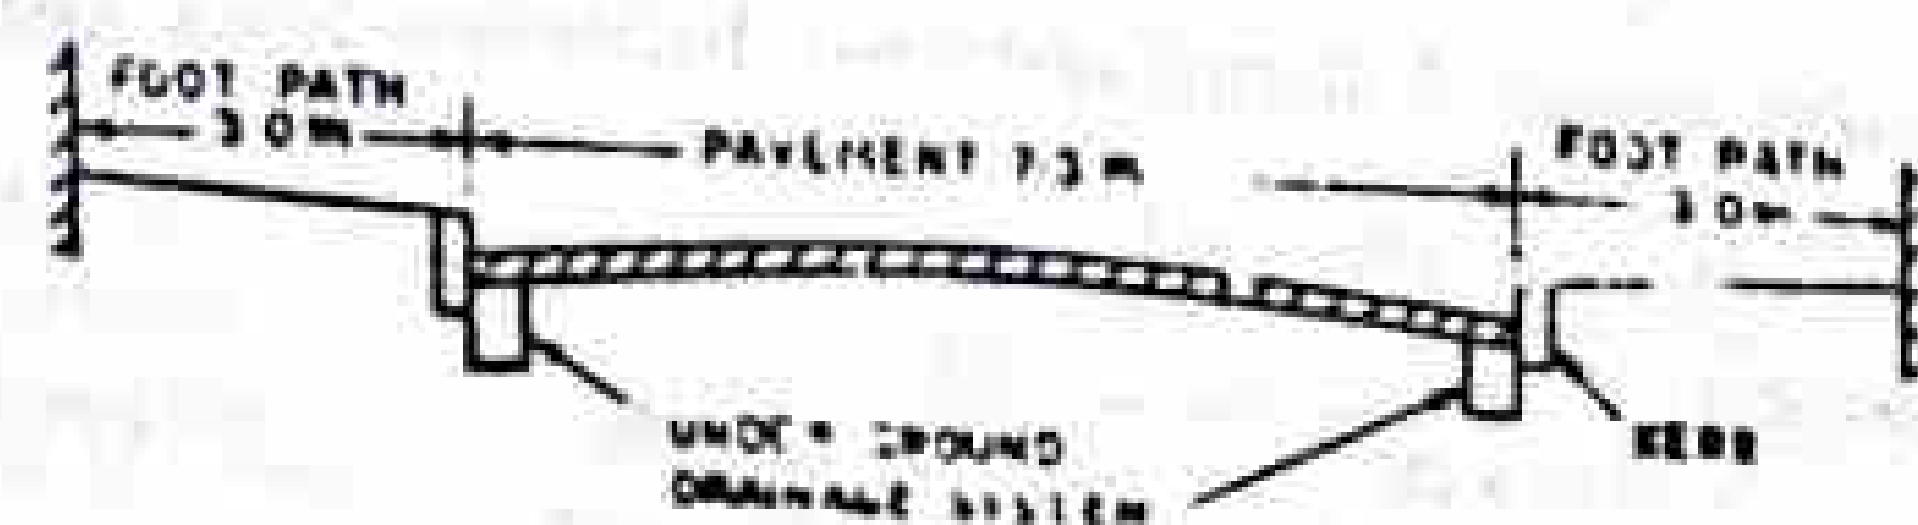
Cross Section of Two-lane City Road in Built-up Area
